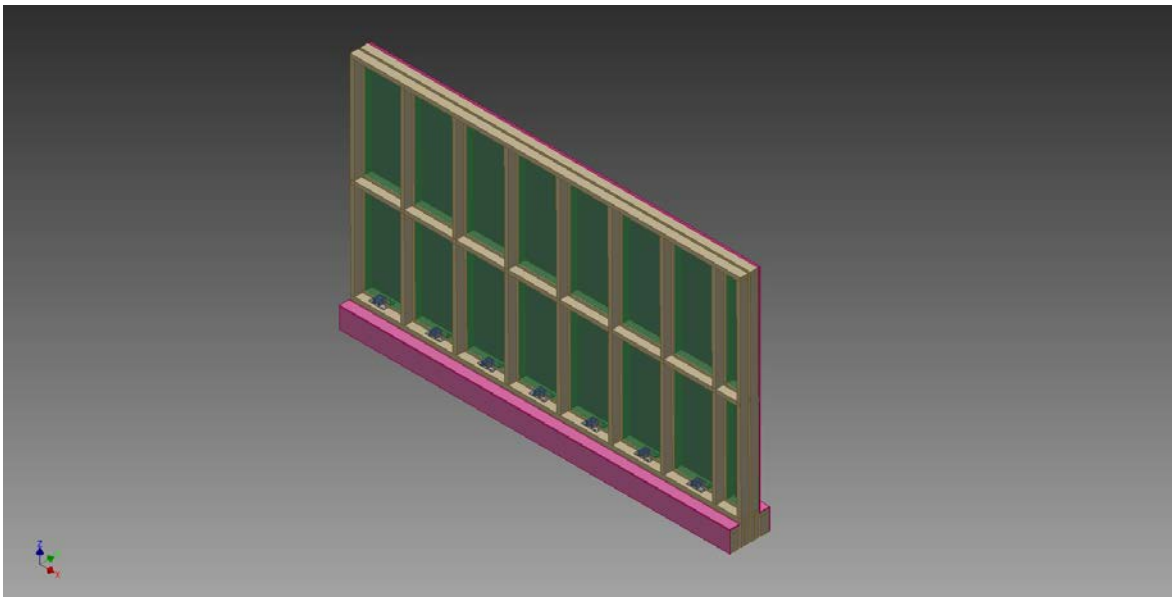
Cut away (front plasterboard removed) of the double stud test wall showing the positioning of the connectors.
